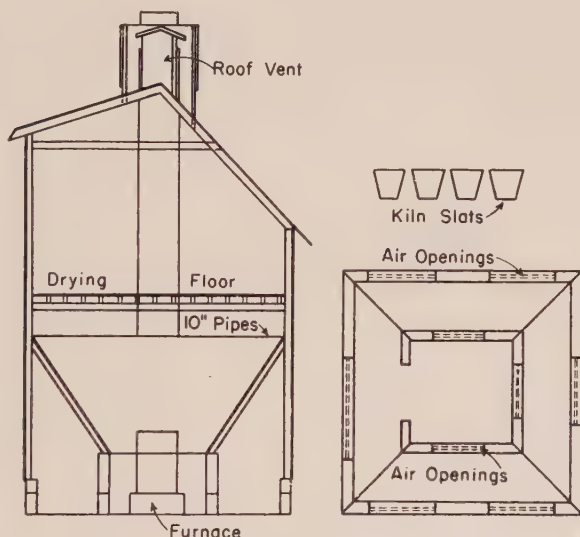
Cross sections of simple kiln-type drier.⁵⁰⁵ Some operators install fans in roof vent to speed drying by drawing air through fruit piled on floor (courtesy Avi Publishing Co.).
